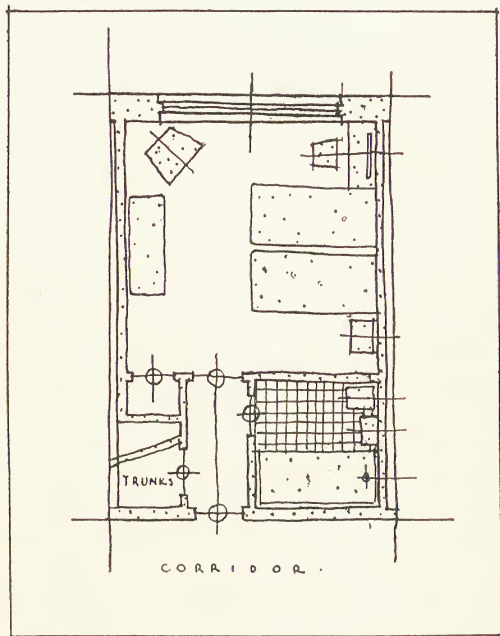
TYPICAL BEDROOM EQUIPMENT
